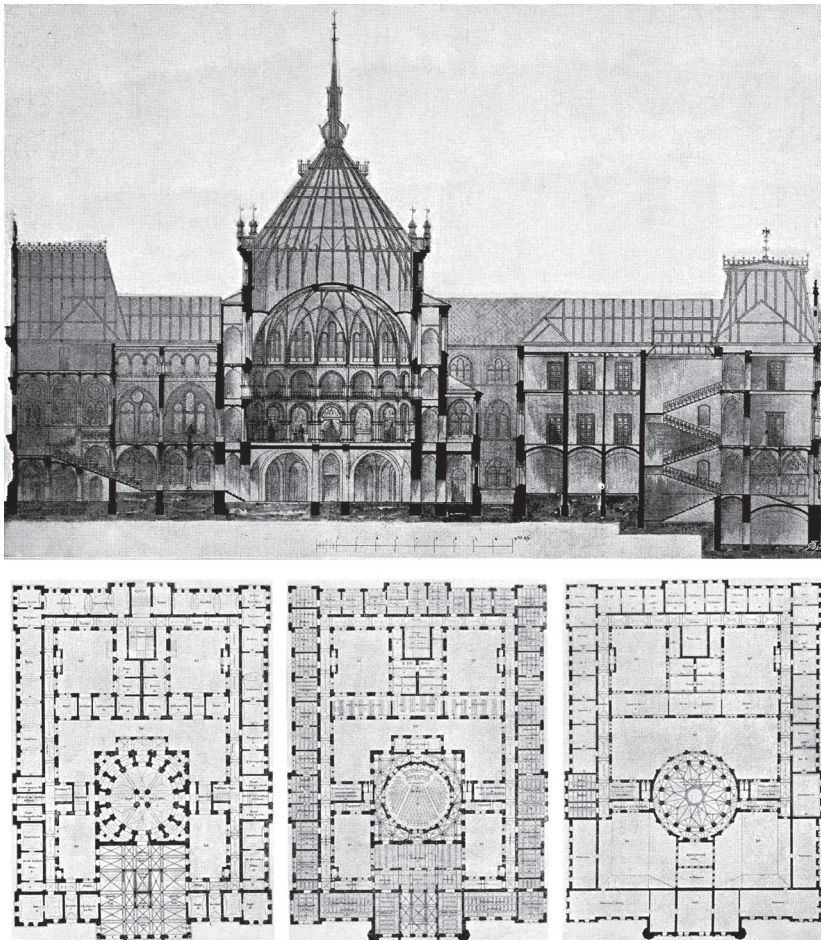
August Prokop, Design for the Moravian Diet, 1867, section and ground plans
